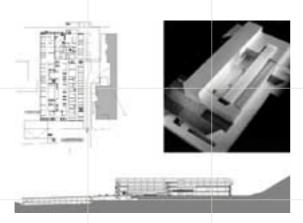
NEW HEALTH PARK BUILDING BAD AUSSEE 2002
